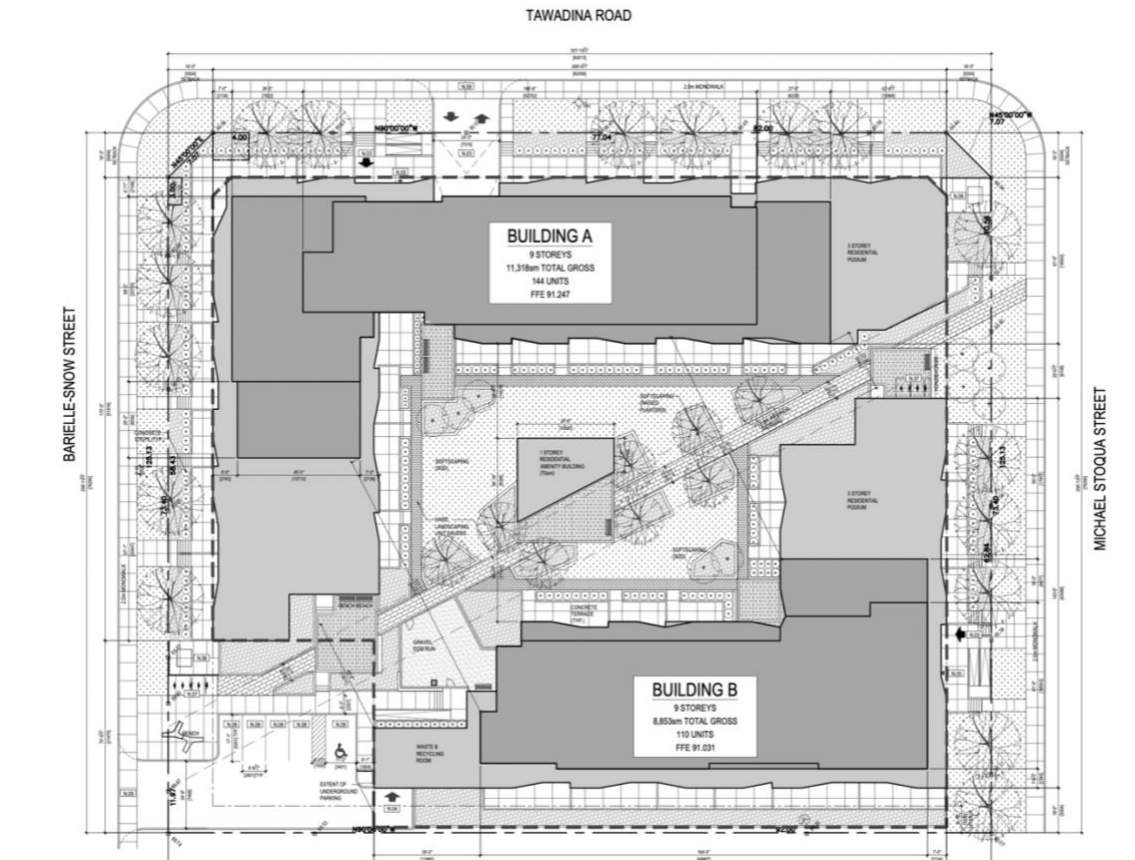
Extract of Site Plan (Prepared by: FAAS)
